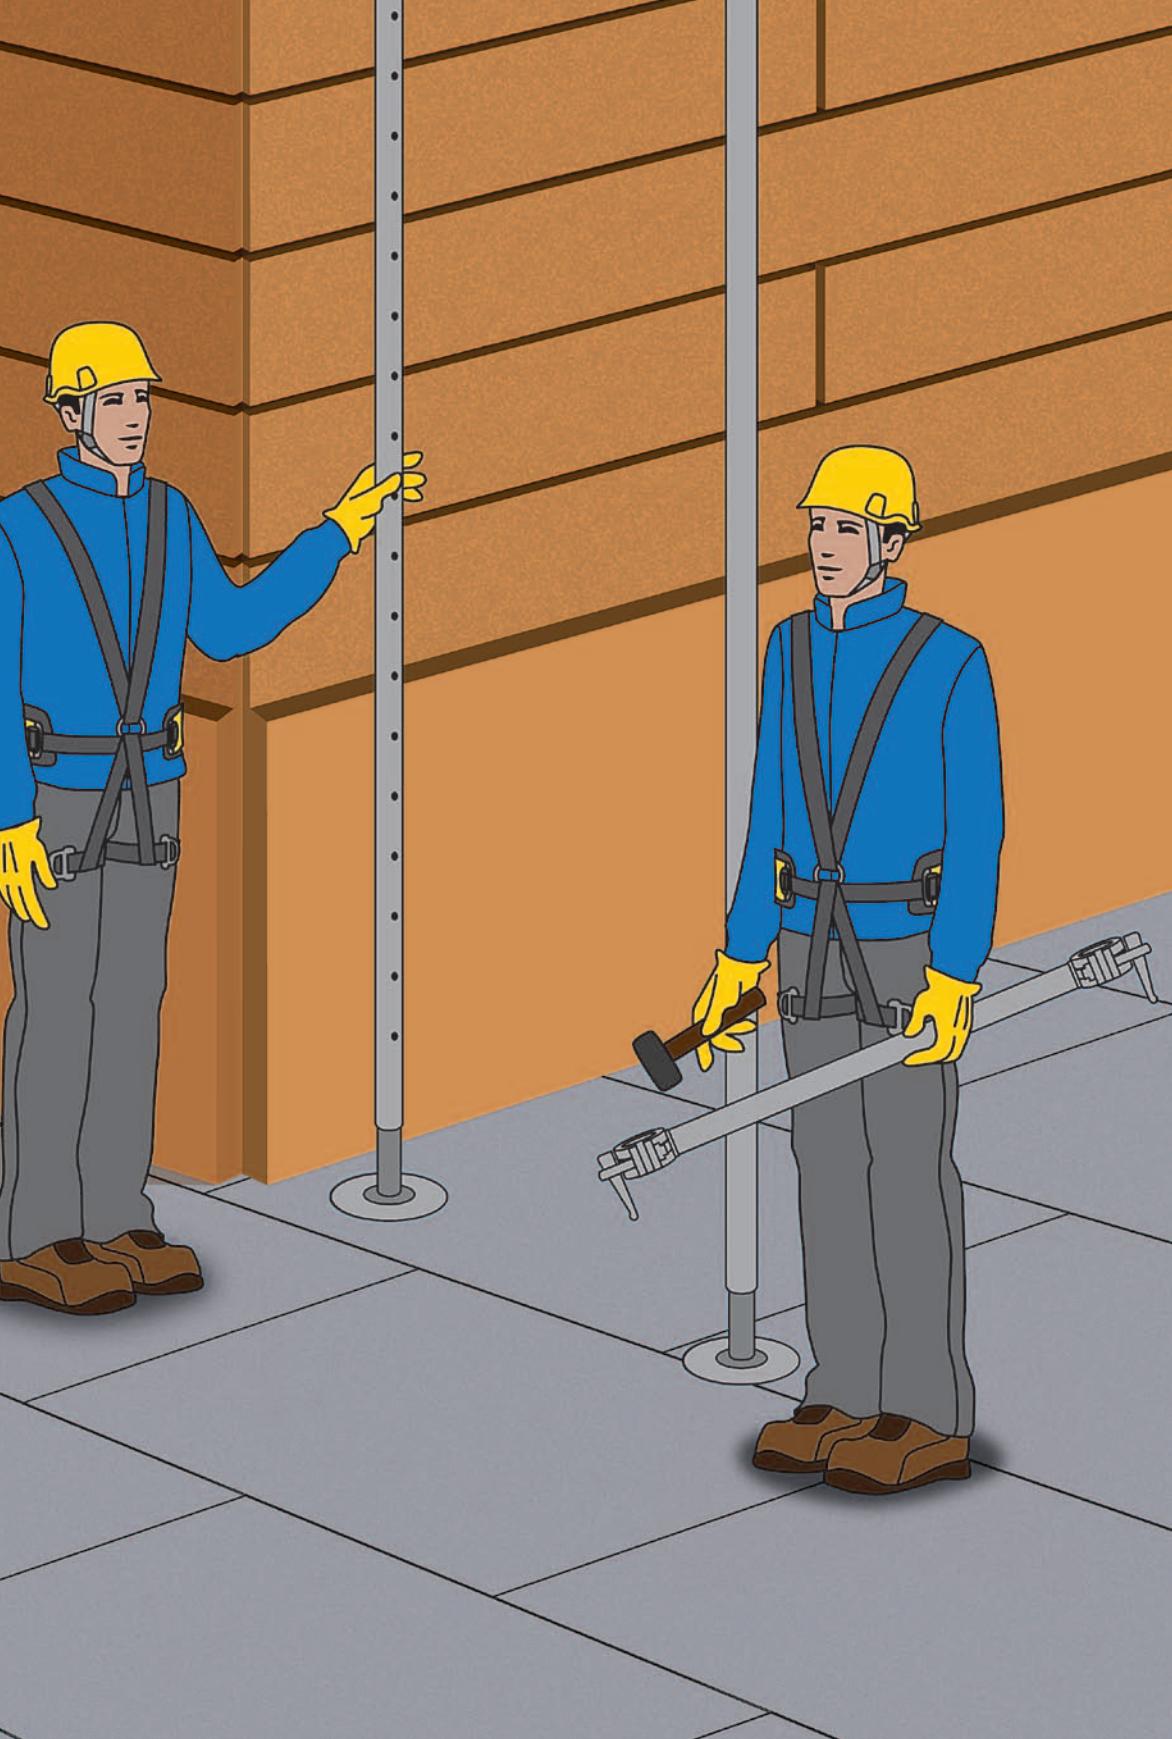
Scaffolding made of prefabricated standard and transoms
